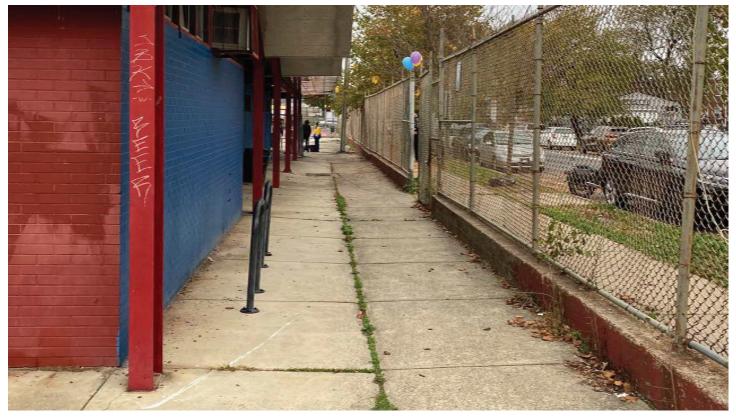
Existing east side of the building that runs parallel to B Street.
